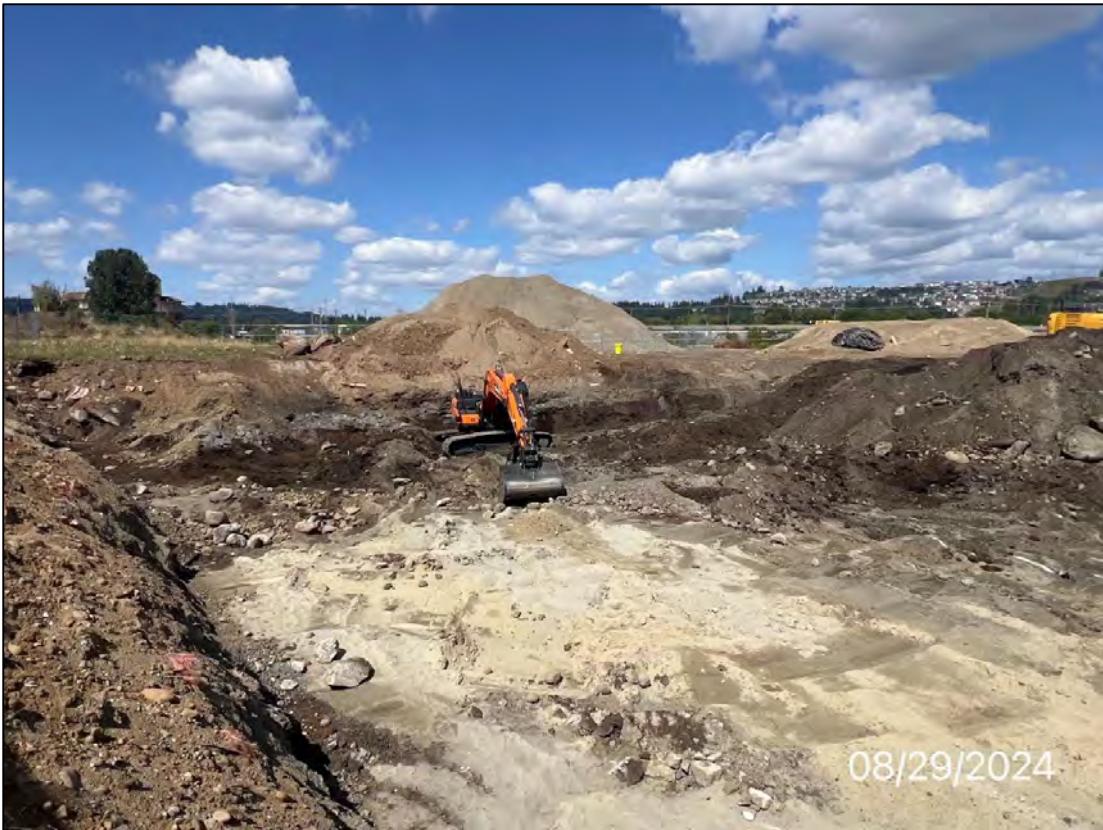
Excavation area in the vicinity of the southwest corner of Building B and roadway area, facing west, 8/29/24.
